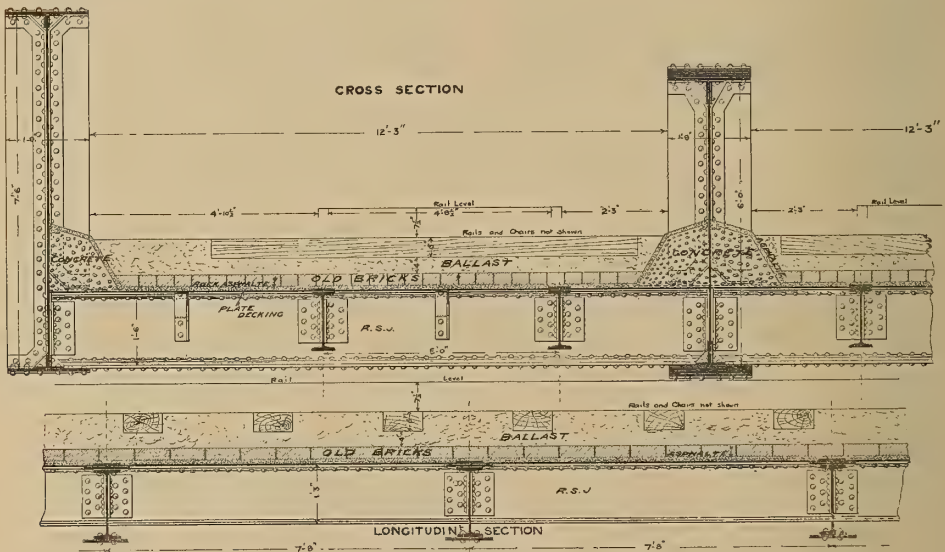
TYPE OF WATER-TIGHT FLOOR FOR BRIDGE WITH BALLASTED ROAD. (STONEFERRY RD. HULL).
